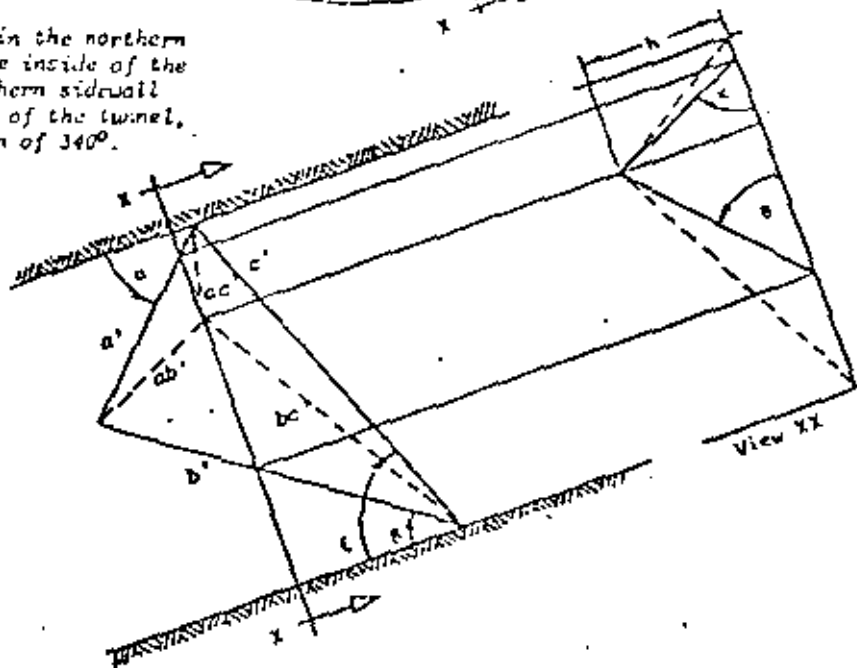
Construction of the true view of a wedge in the sidewall of a tunnel by Method 1.
